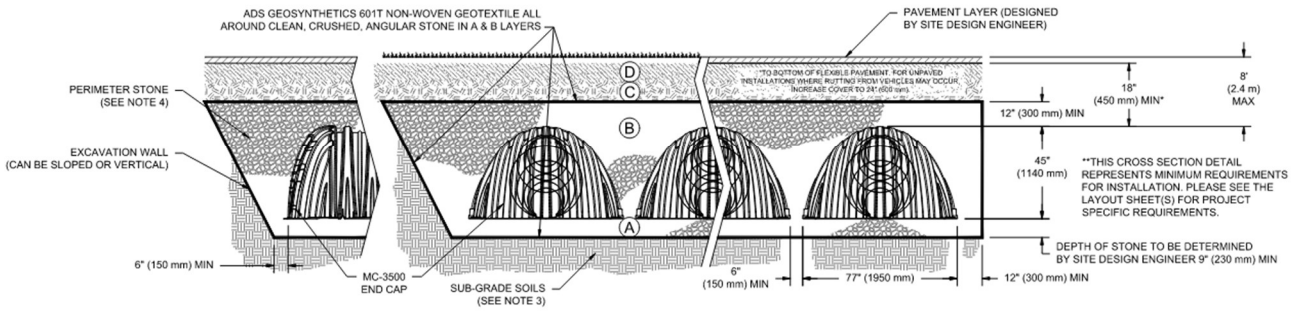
Typical Cross Section Detail through MC-3500 Tank
